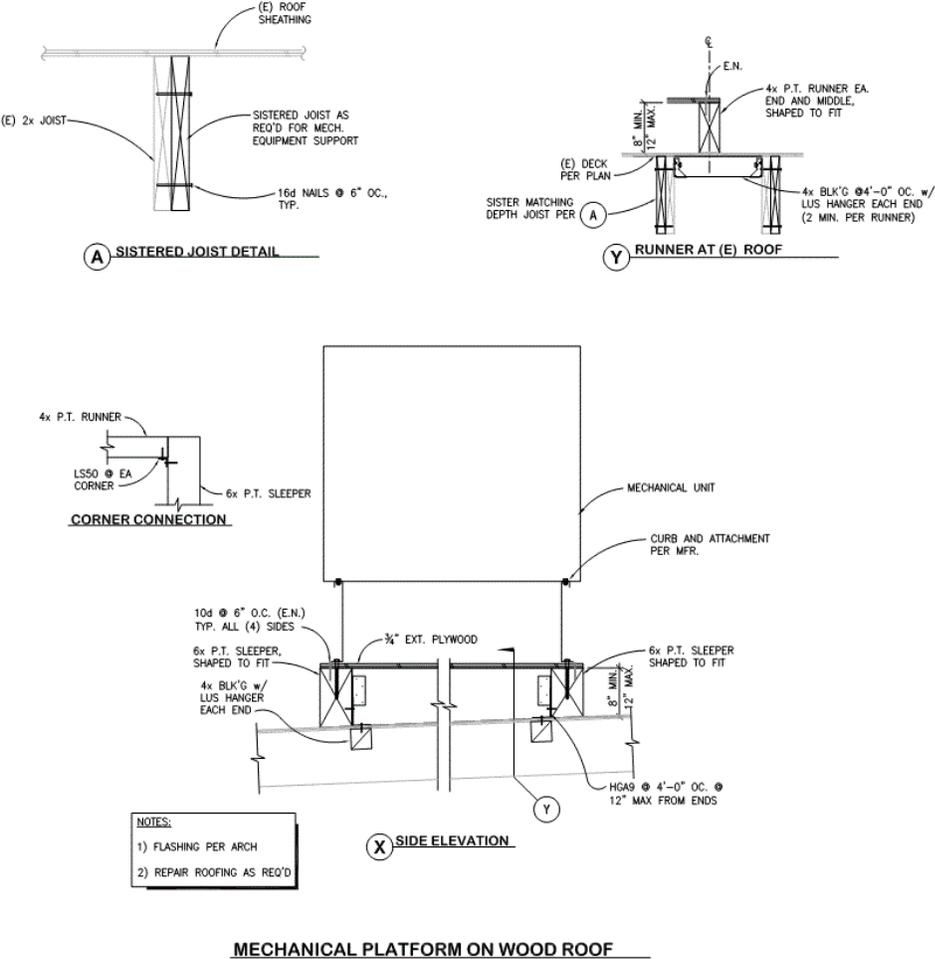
Typical roof joist strengthening and support of new mechanical equipment.
